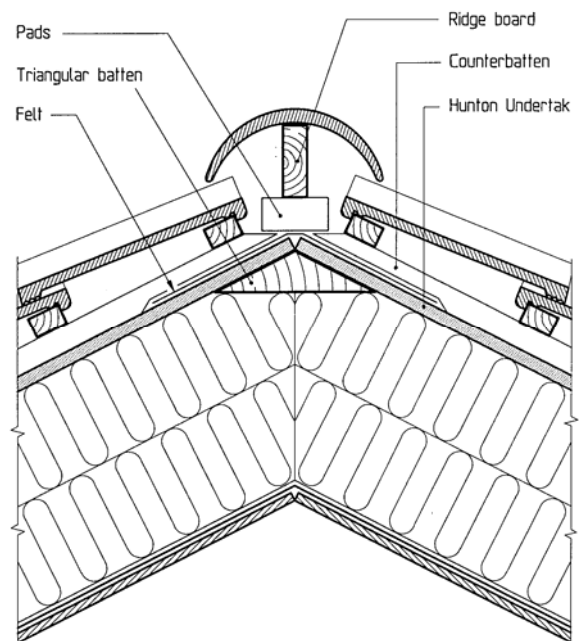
Example of detail at ridge. The connection between the two roof planes must be airtight. Pads are used under the ridge board in order to provide continuous ventilation across the ridge.
